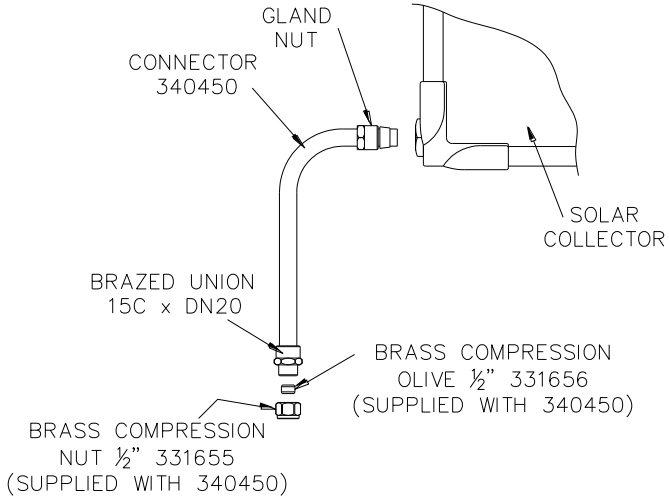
DETAIL G – END PLUG ASSEMBLY – CONETITE FITTINGCOUPLING COLD AND HOT PIPES TO COLLECTOR – CONETITE FITTING
